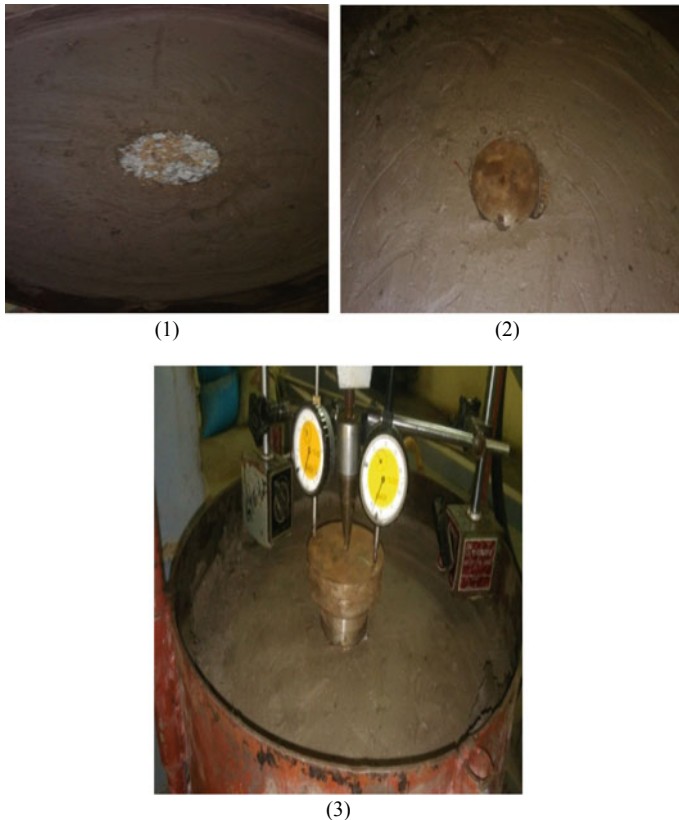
a Preparation of a stone column, b Loading plate placed on the stone column area, c Dial gauges were arranged on loading plate
